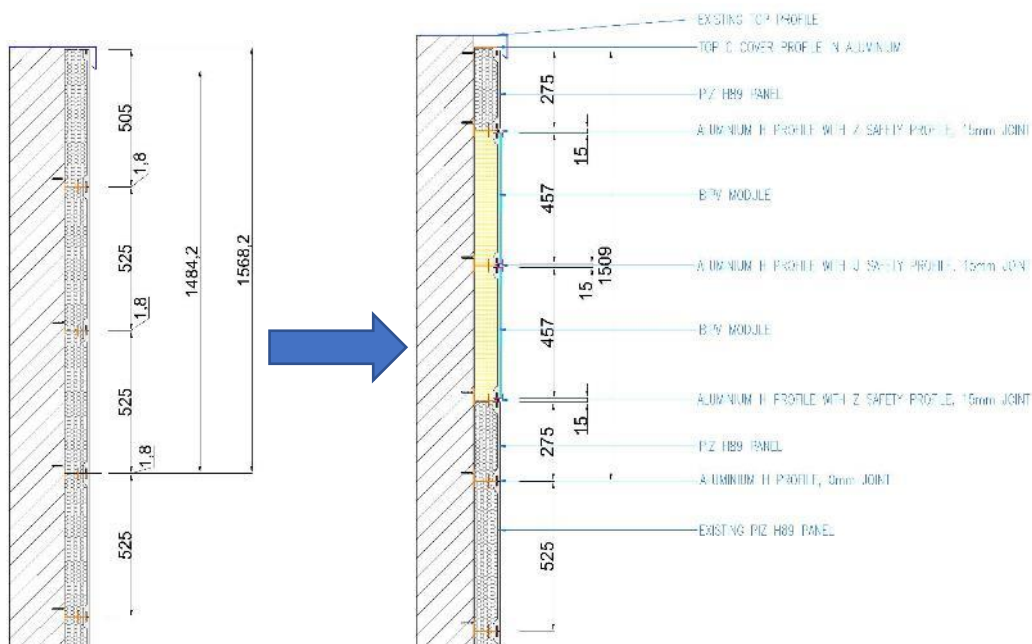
Demo-site 4, typical wall section before BIPV installation
